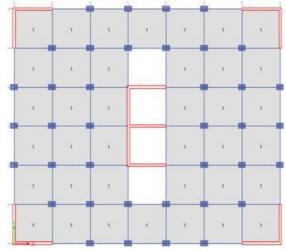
Plan of Building at 1st to 9<sup>th</sup> and 11<sup>th</sup> to 20<sup>th</sup> Floor level (SDL = 1 kN/sqm)
